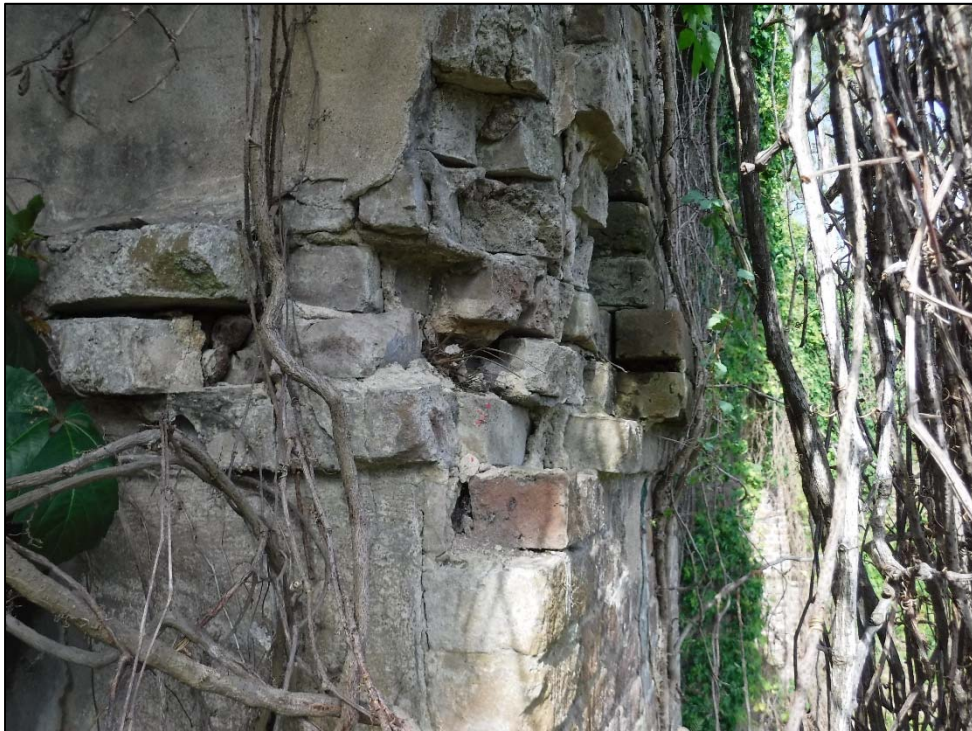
Deteriorated Previous Repair and Brick Masonry in Weep Drains
